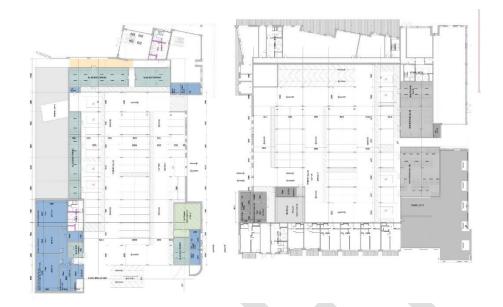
Parking Layout at Lower Ground Level (55 spaces)
